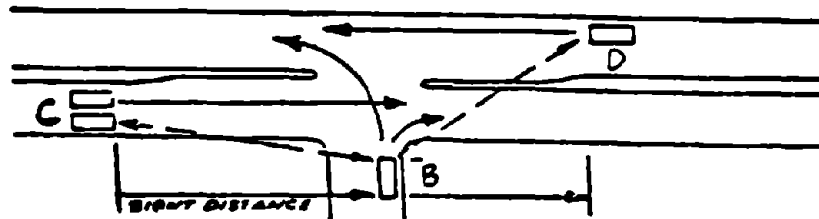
Intersection Sight Distance at At-Grade Intersections
